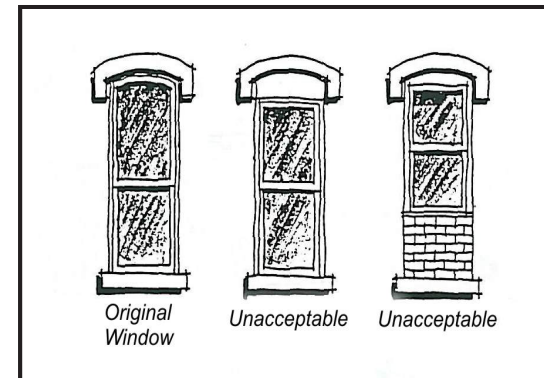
Replacement windows should be consistent with the style and quality of original windows
